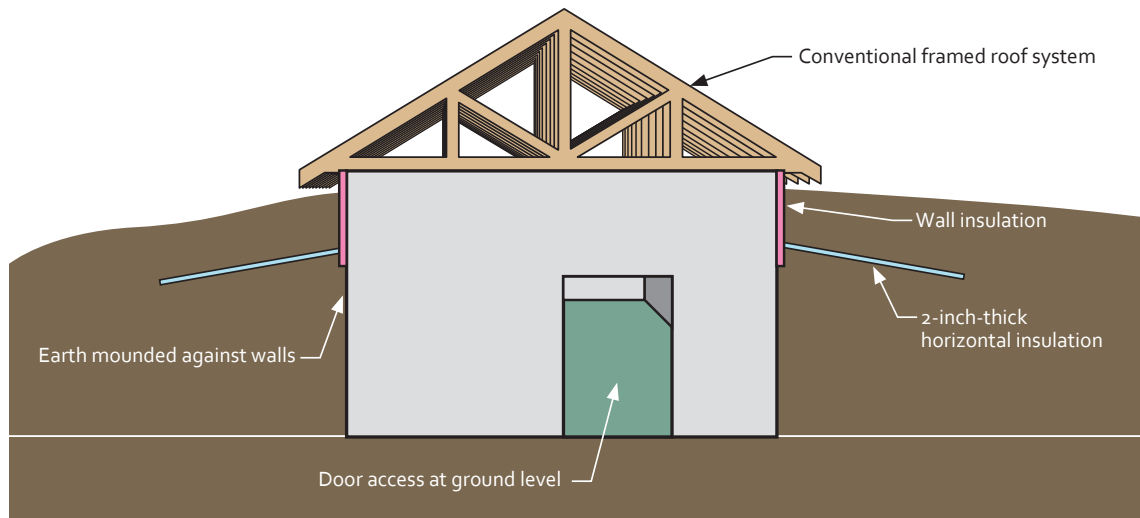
Cross-section of modern root cellar construction. (Sanford)
